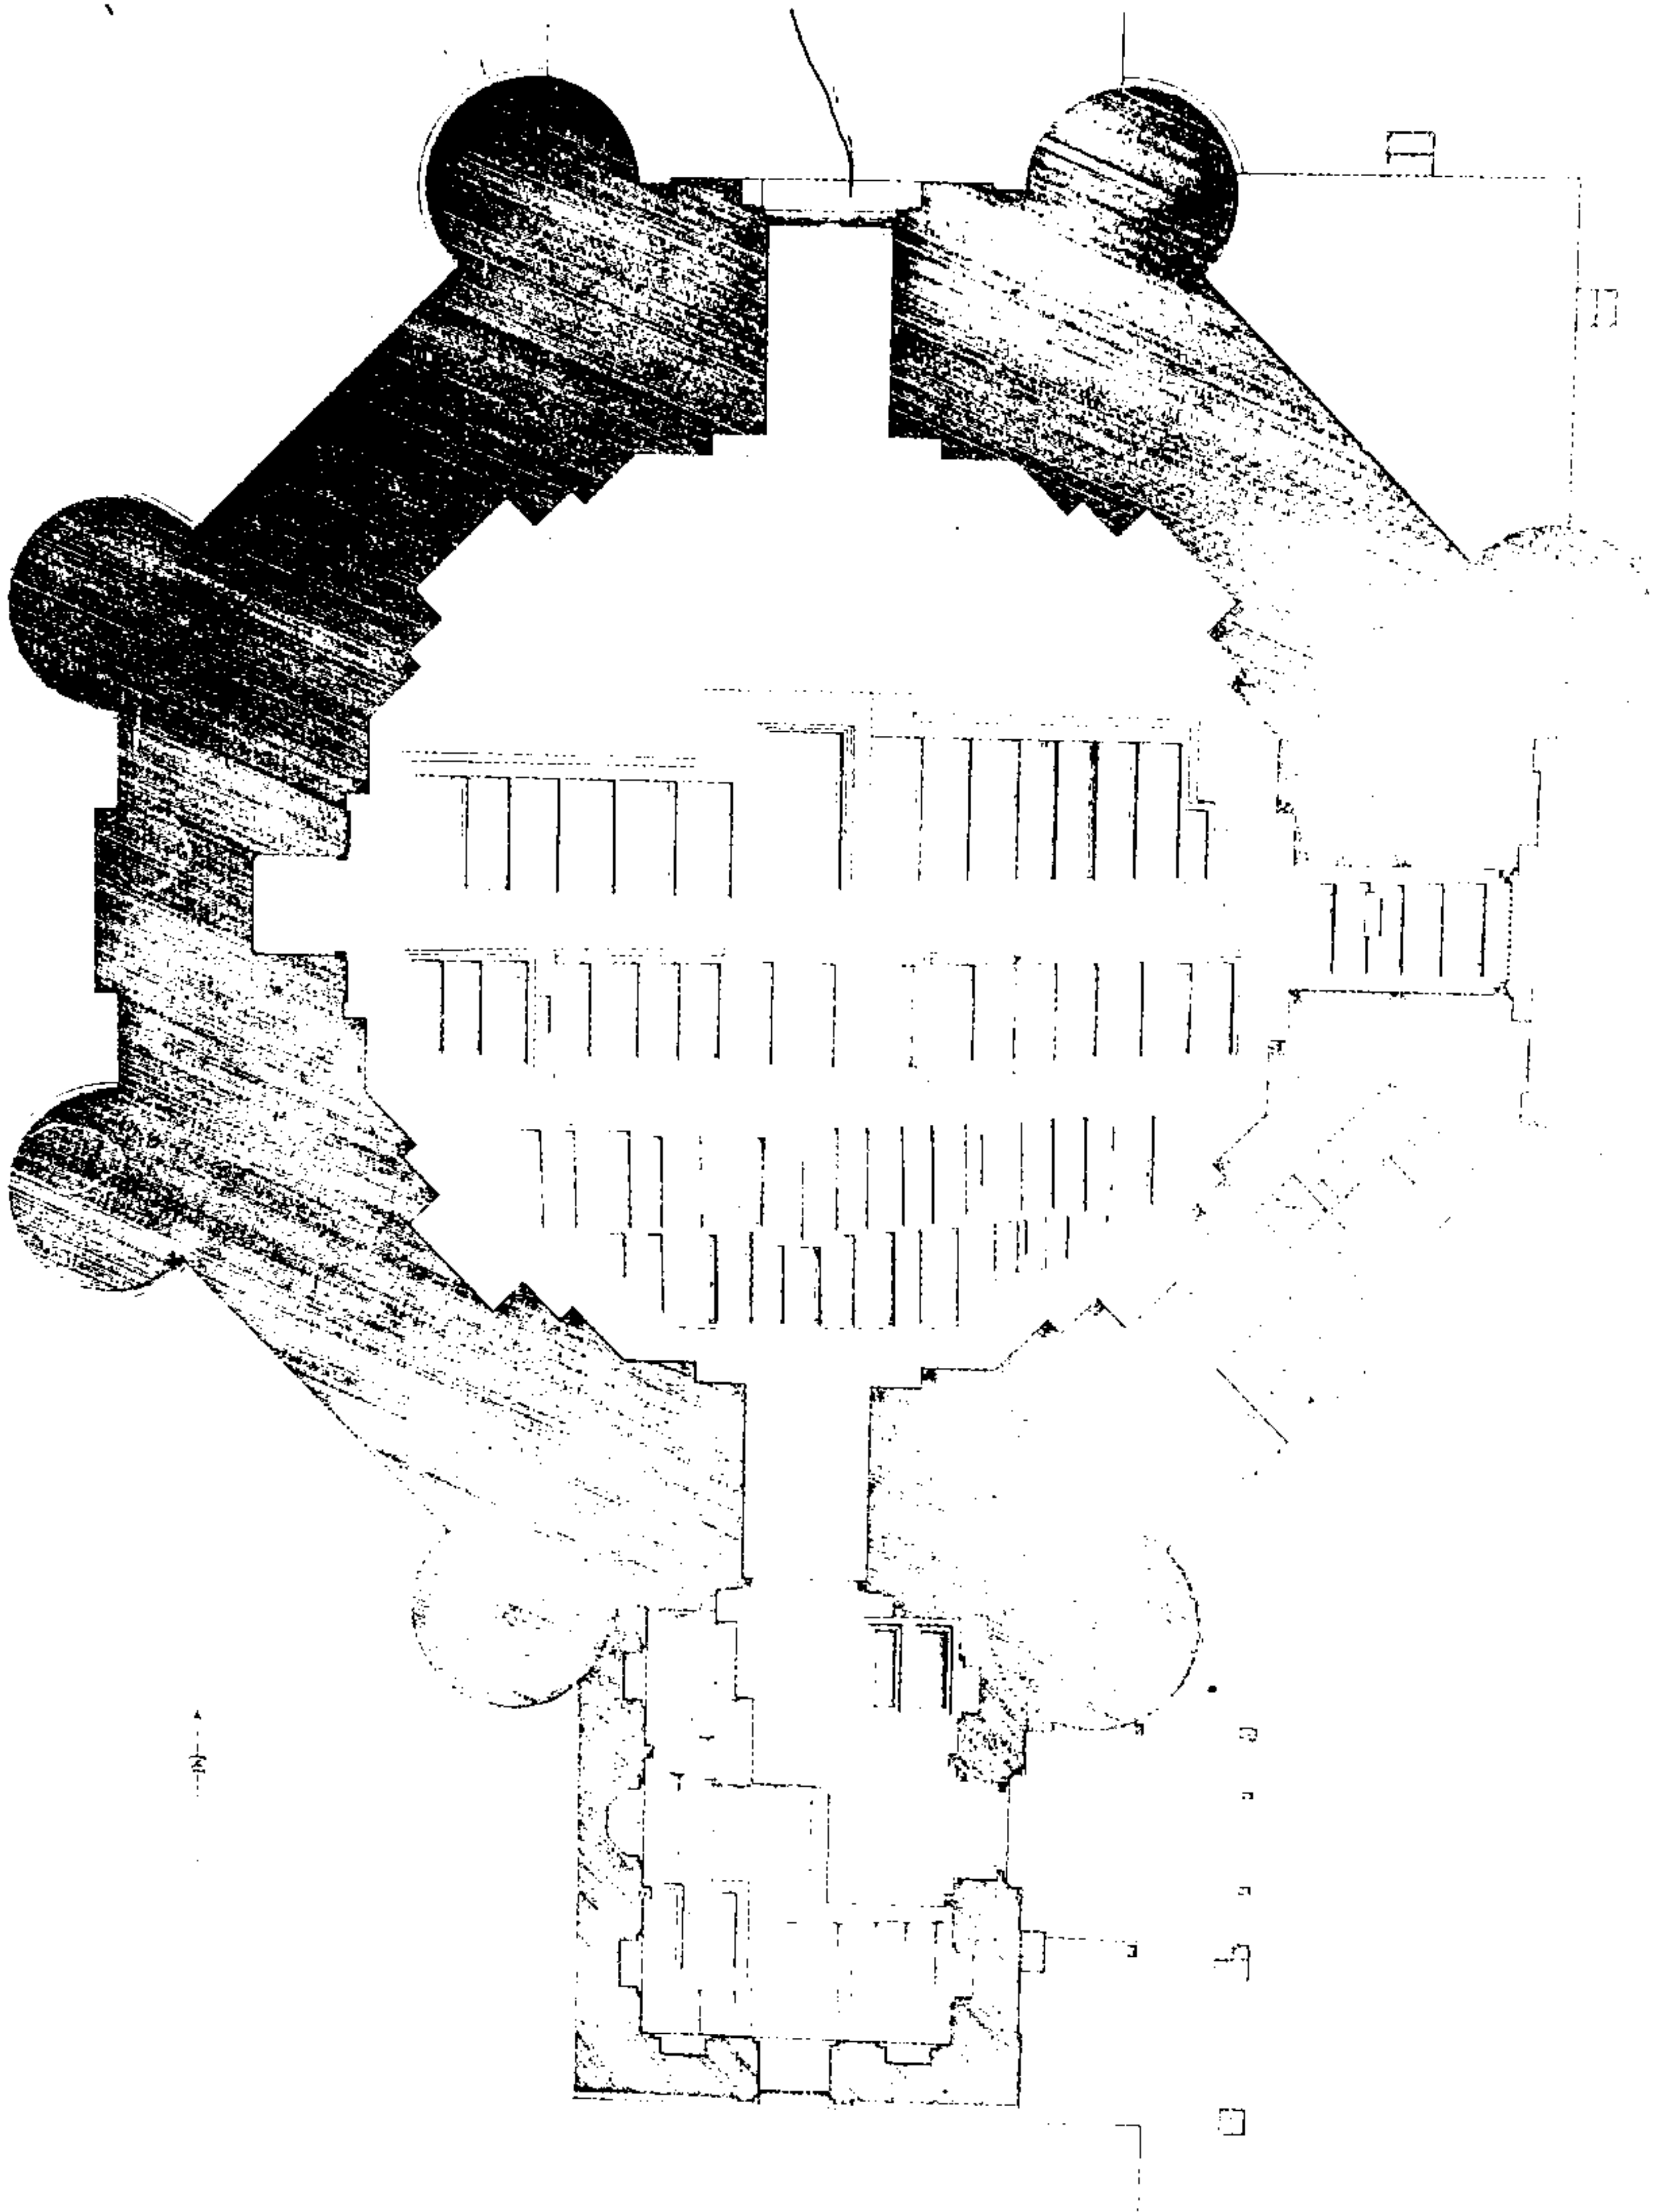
Fig. X : Multan : Mausoleum of Rukn-e-Alam. - Ground floor plan.
